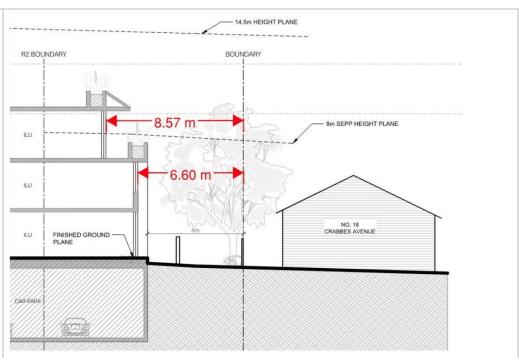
Extract of Section A for Block B showing setback from adjoining dwelling 18 Crabbes Avenue. (Source: Hyecorp/Amglen)
